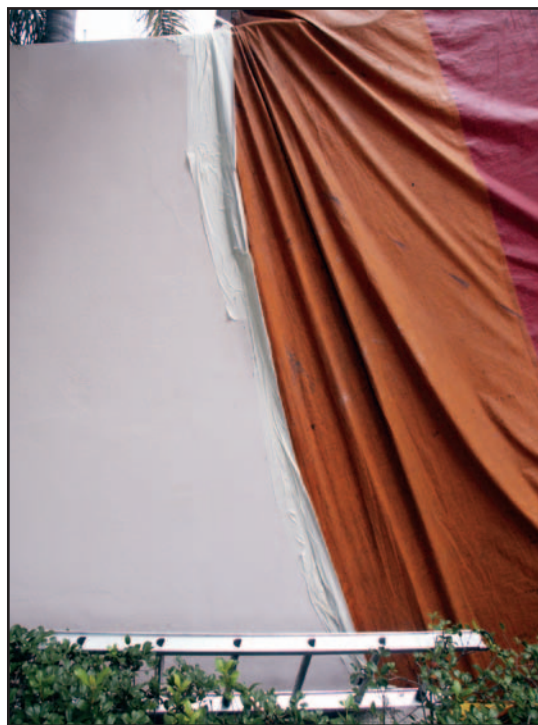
Tape can be used to secure a tarpaulin to an impermeable wall.
